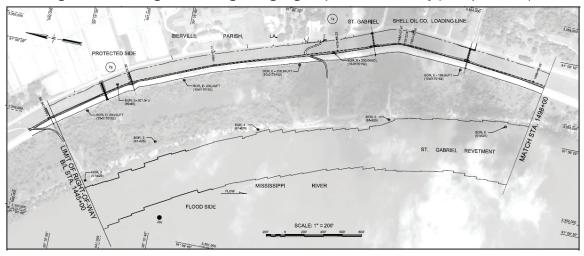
Northings and eastings along edge of plan view boundary (example shown).
